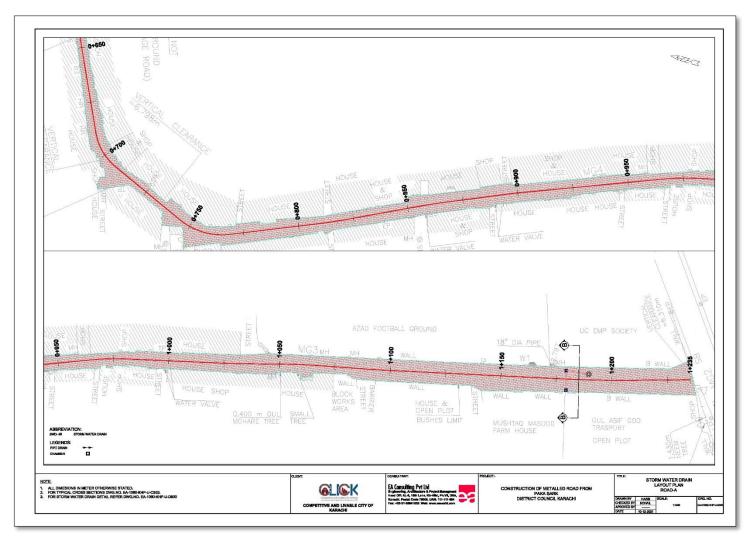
Layout Plan for the Proposed Rehabilitation of Paka Sarak Layout - 02
